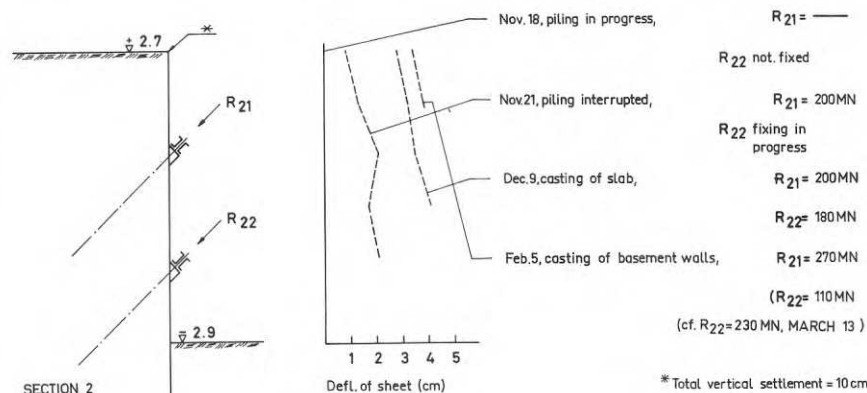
Deformation in sheet piling and measured tie forces in Section 2 according to FIG. 1.
